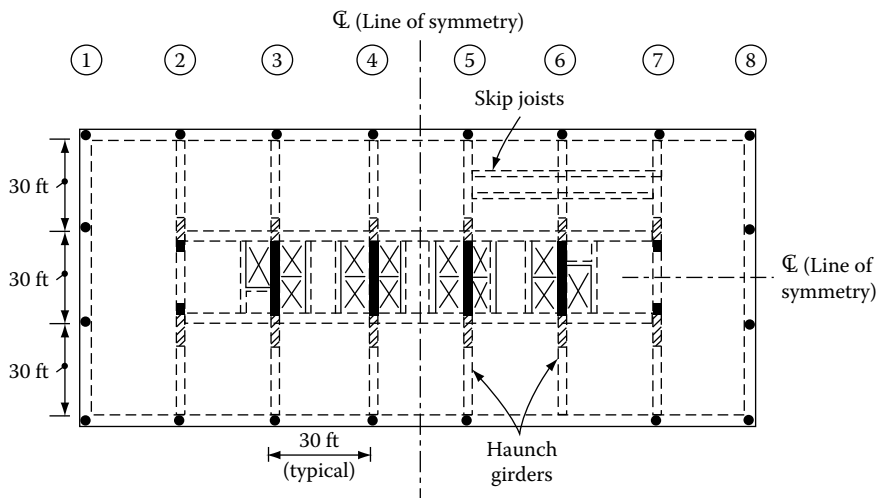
Example of shear wall–frame interaction: Typical floor plan.
